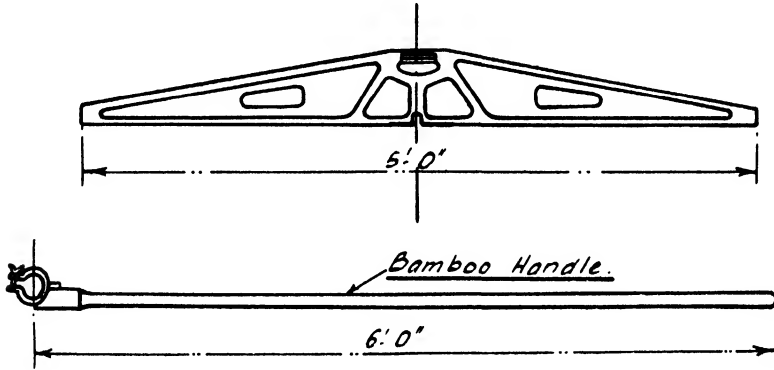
STRAIGHTEDGE FOR CHECKING SURFACE LEVEL.
